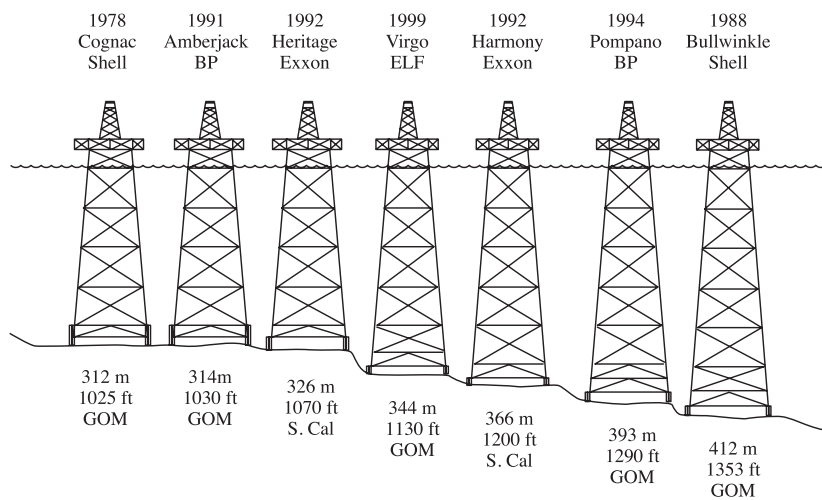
Fixed platforms by installation year and installation company: two decades to the limit
